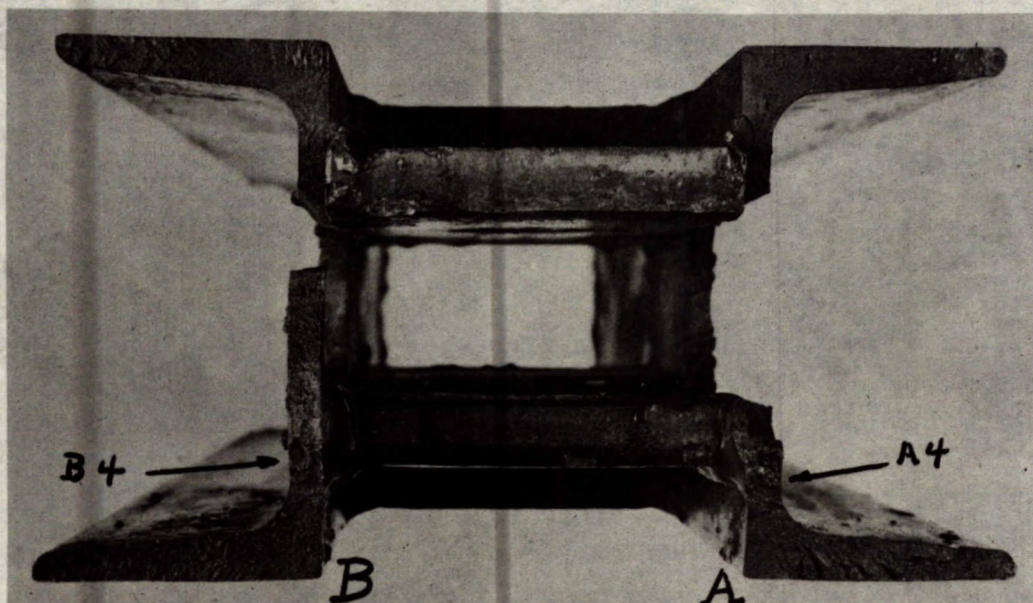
View of the fractured surfaces in the two channels and showing also the locations of sections A4 and B4 which were subsequently removed for examination.
